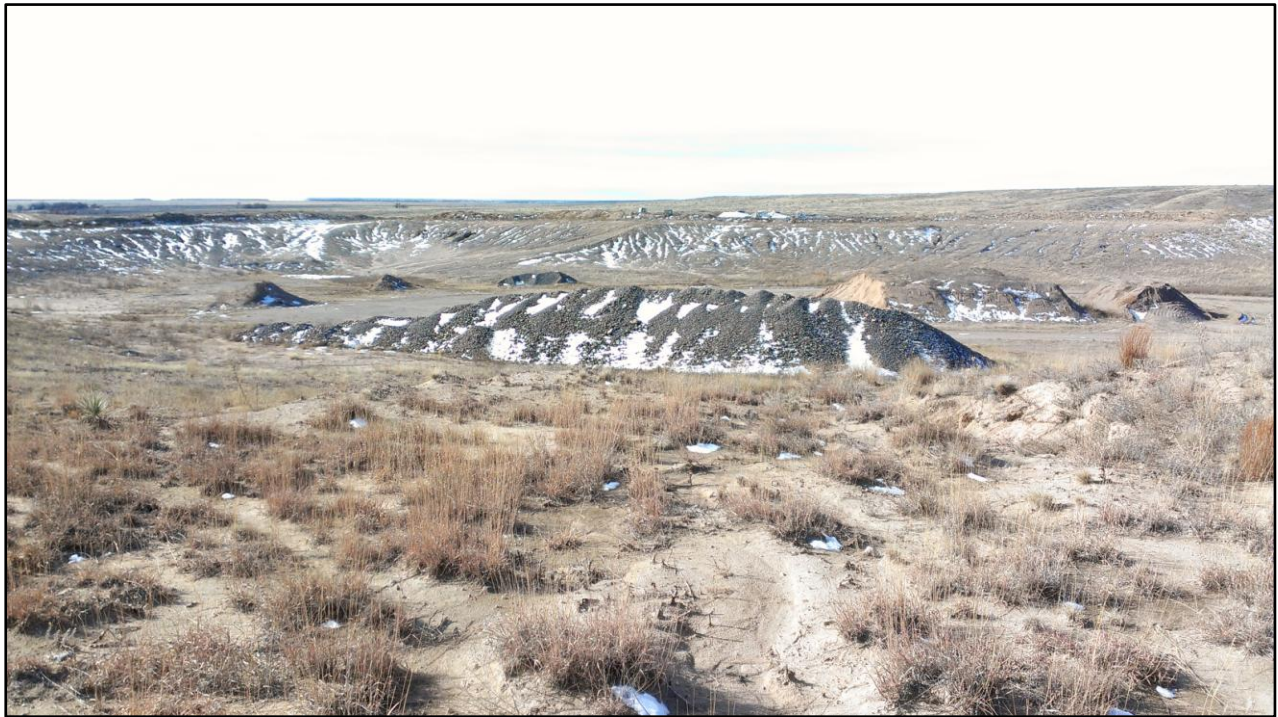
View looking west into pit from top of eastern pit wall, showing slopes graded flatter than 3H:1V. Note native grasses and shrubs establishing across pit slopes. Also note mined material stockpiled at center.
